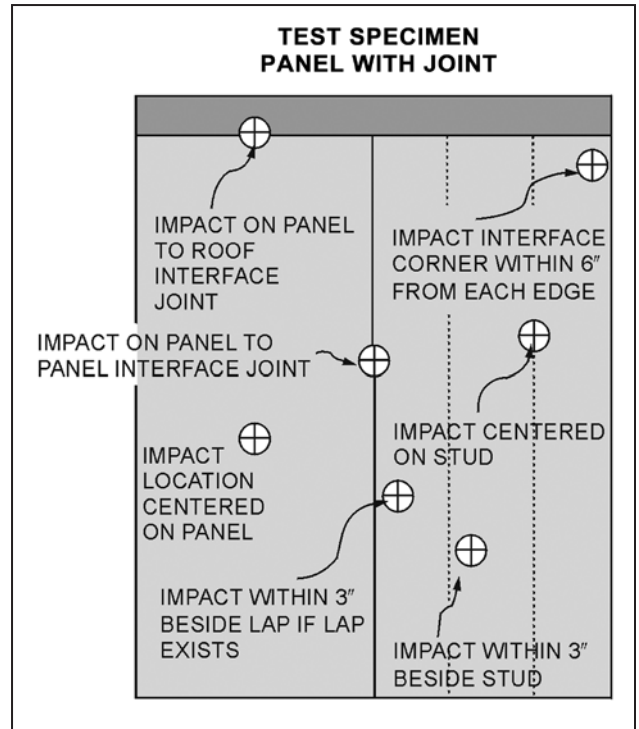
Impact test locations for a panel or framed roof or wall assembly
